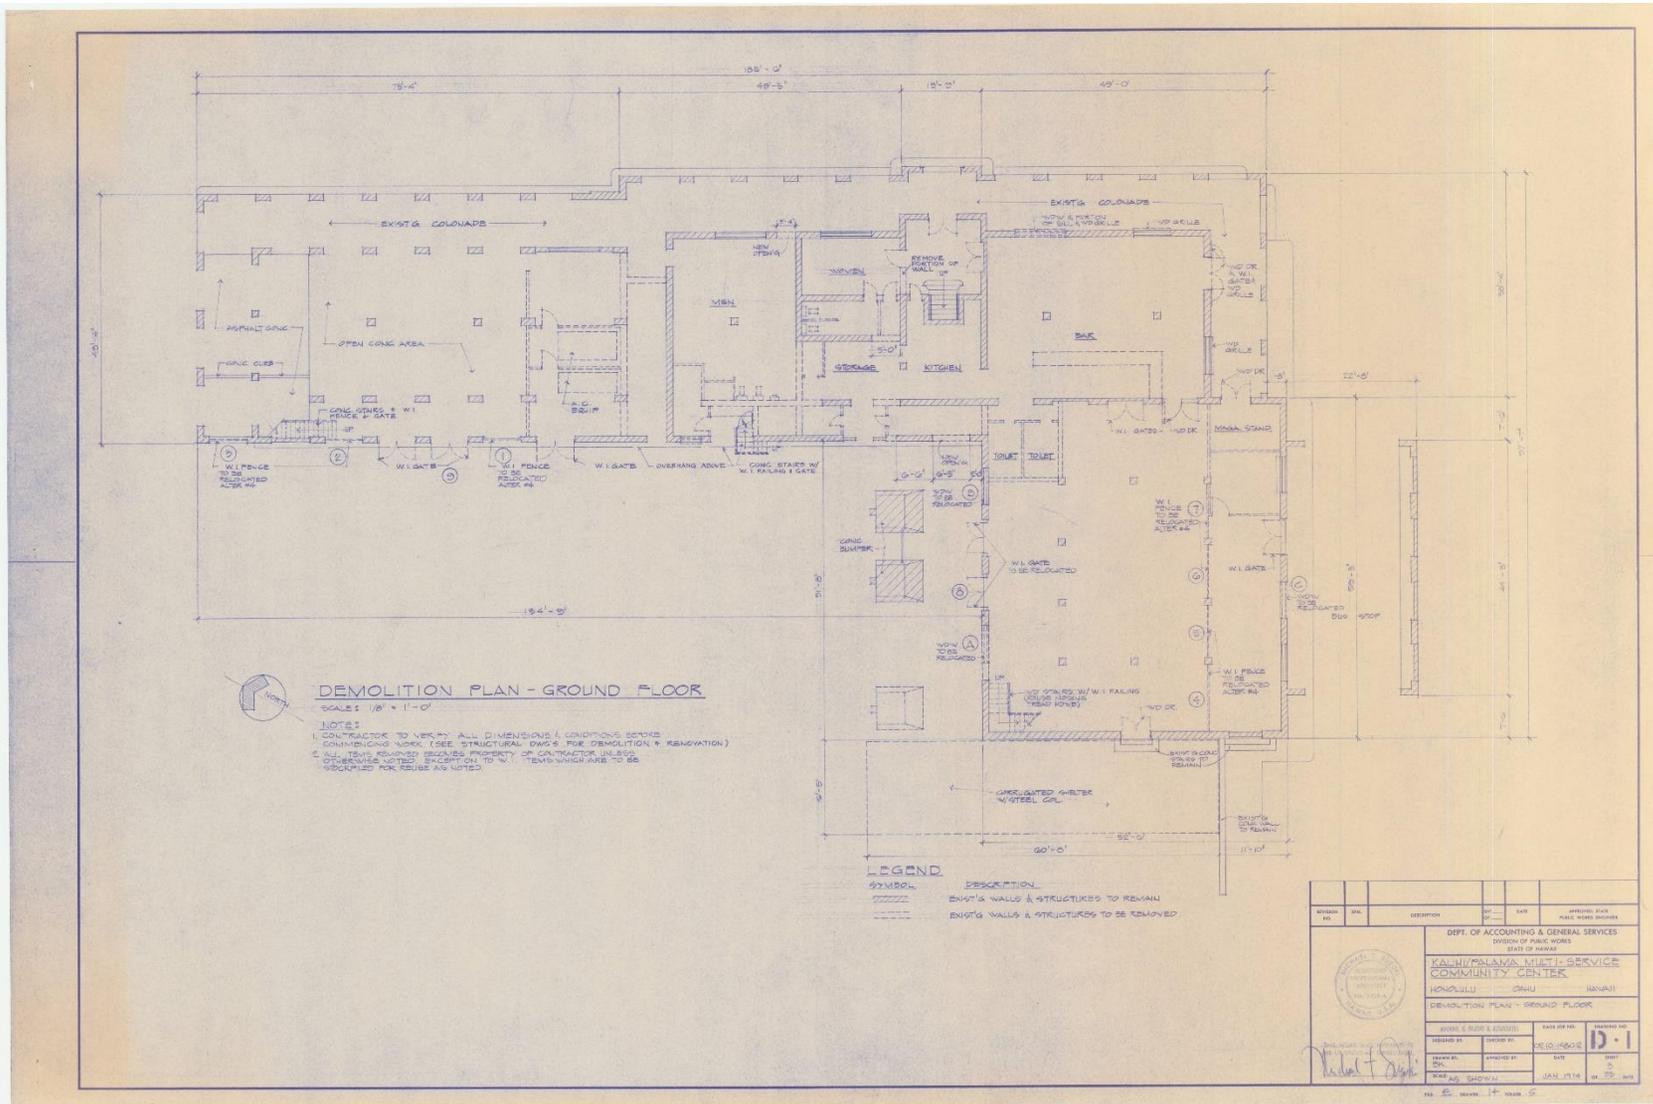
Photograph of 1975 Hawaii State Department of Accounting and General Services first floor demolition drawing. Courtesy Hawaiian Railway Society.
